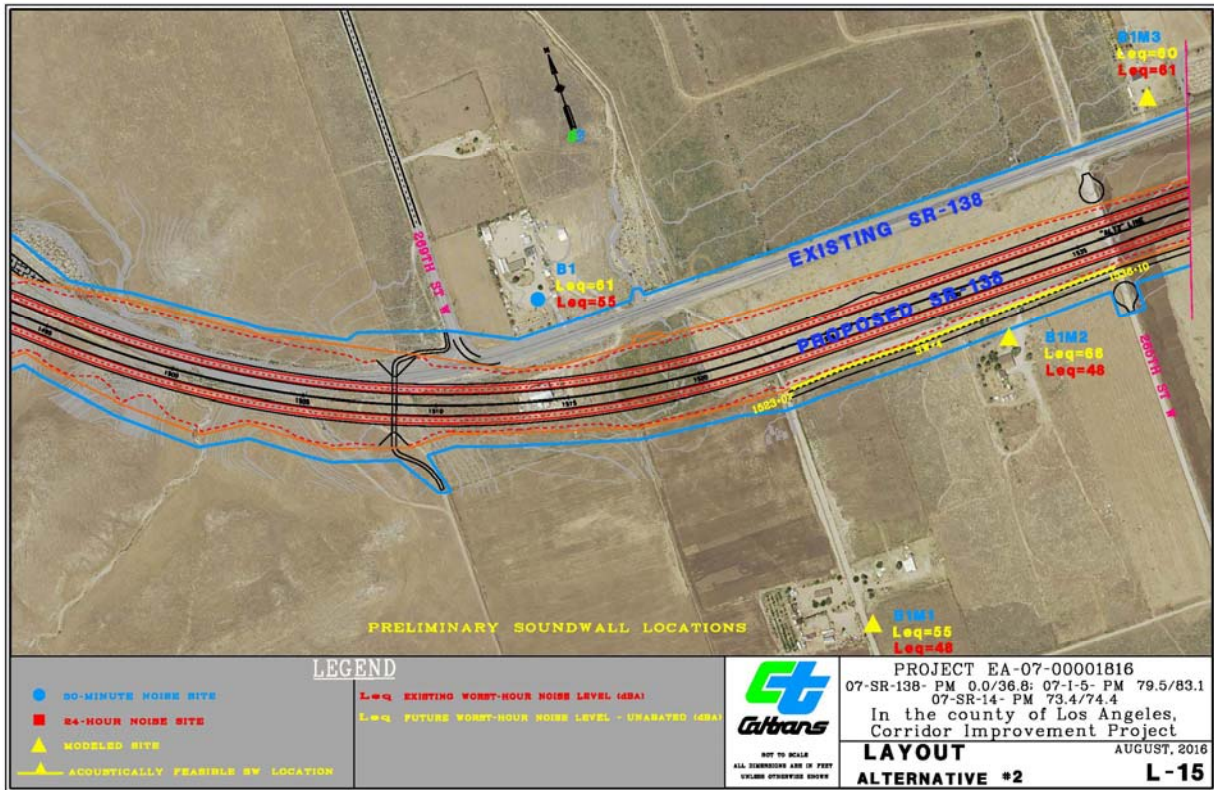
Alternative 2 Soundwall Location – 5 and 6
